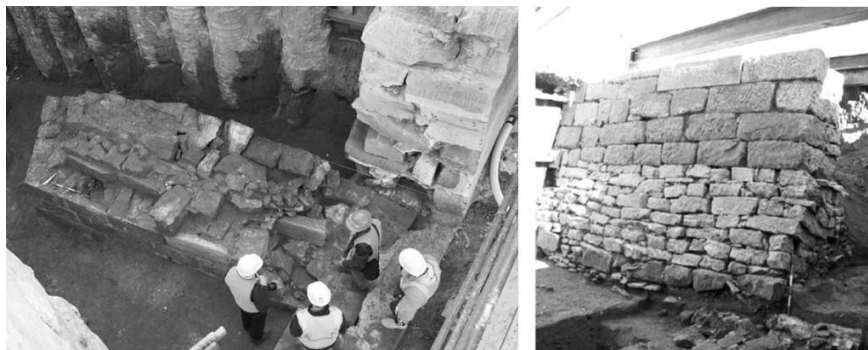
Parramatta Bridge archaeological excavation. Left, remains of a pier of the former timber beam bridge at the crossing; right, an un-mortared retaining wall (Images courtesy of Parramatta City Council).
